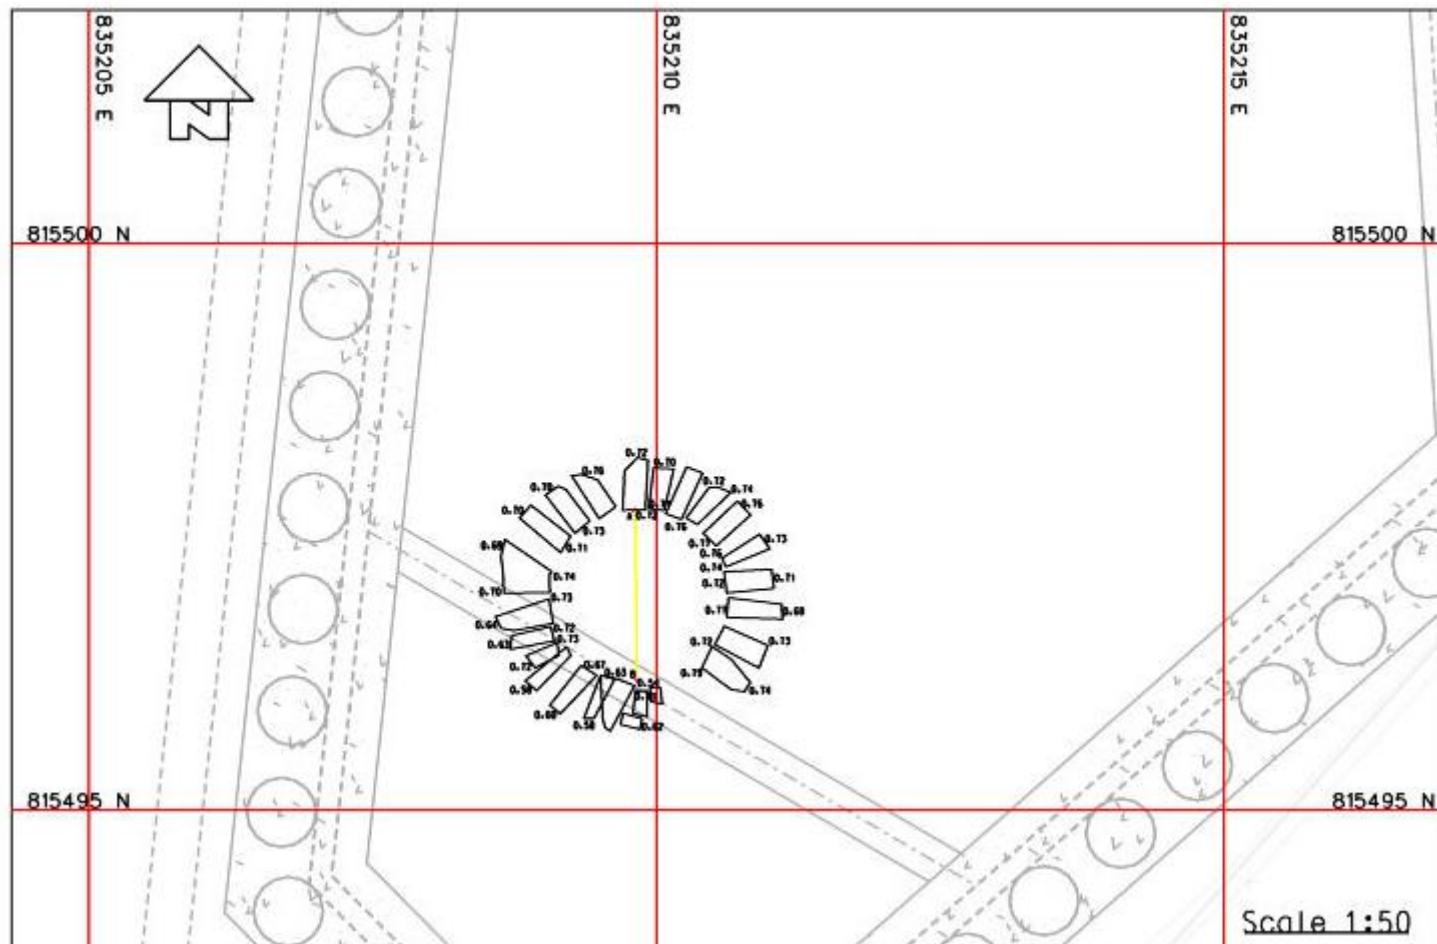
Drawing of well shaft after removal of concrete infill (901-RISC-SUR-000705A) (drawing at 75%); yellow line within the shaft indicates the location of recorded profile during excavation see Plate 3c and Figure 12.
